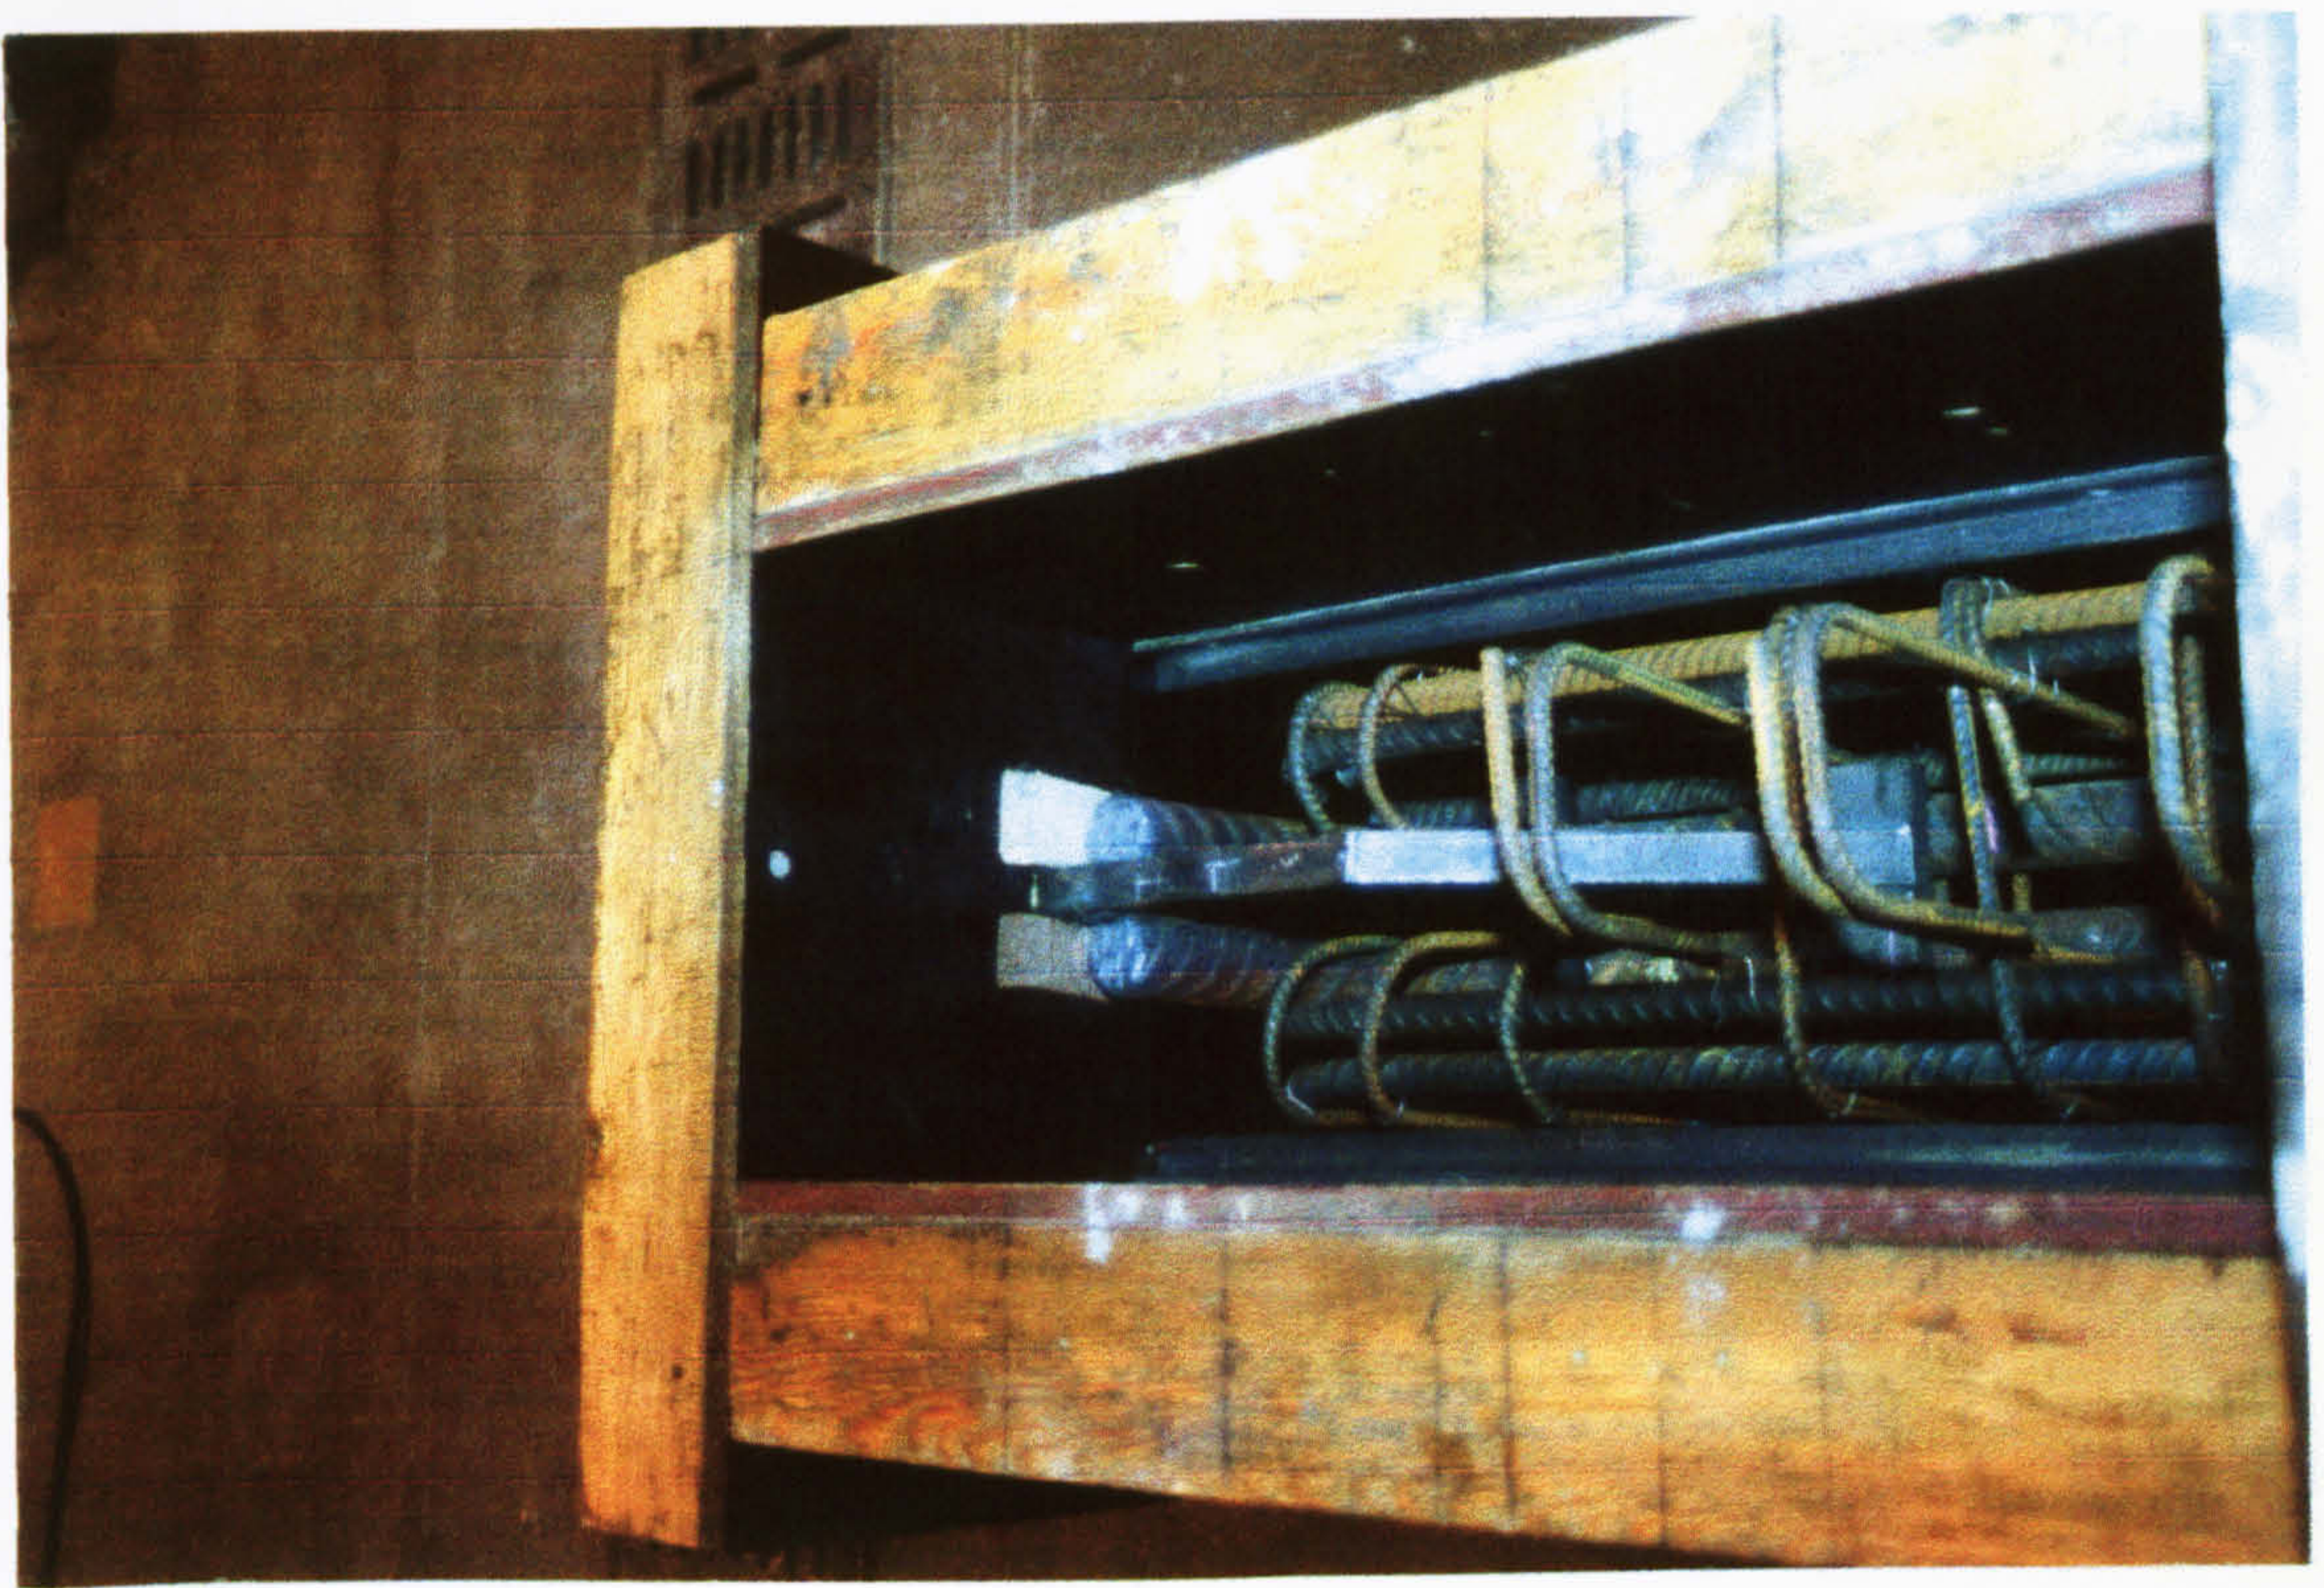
Beam reinforcement with standard beam connection plate and special links
